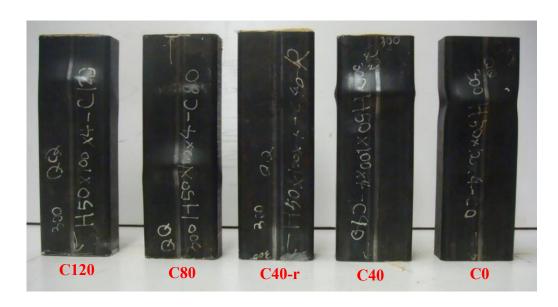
Failure modes of stub columns (series 100×50×4-A)
